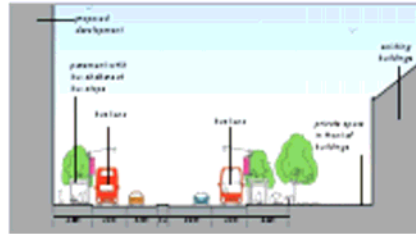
NEW KENT ROAD - proposed section and images of New Kent Road - the New Kent Road
